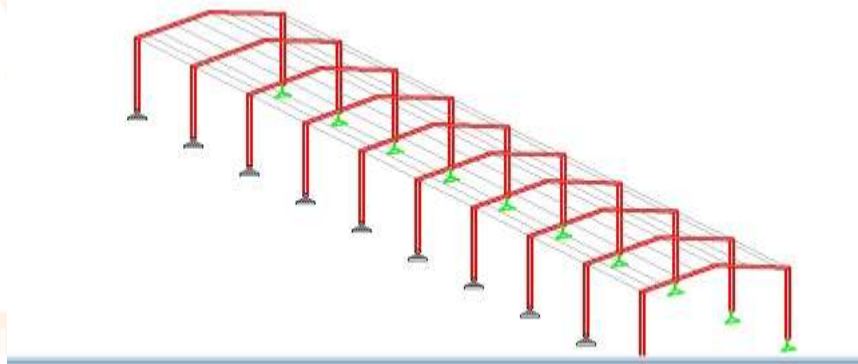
STAAD.Pro Generated Pre-Engineered Building (PEB) with 9 Bays
